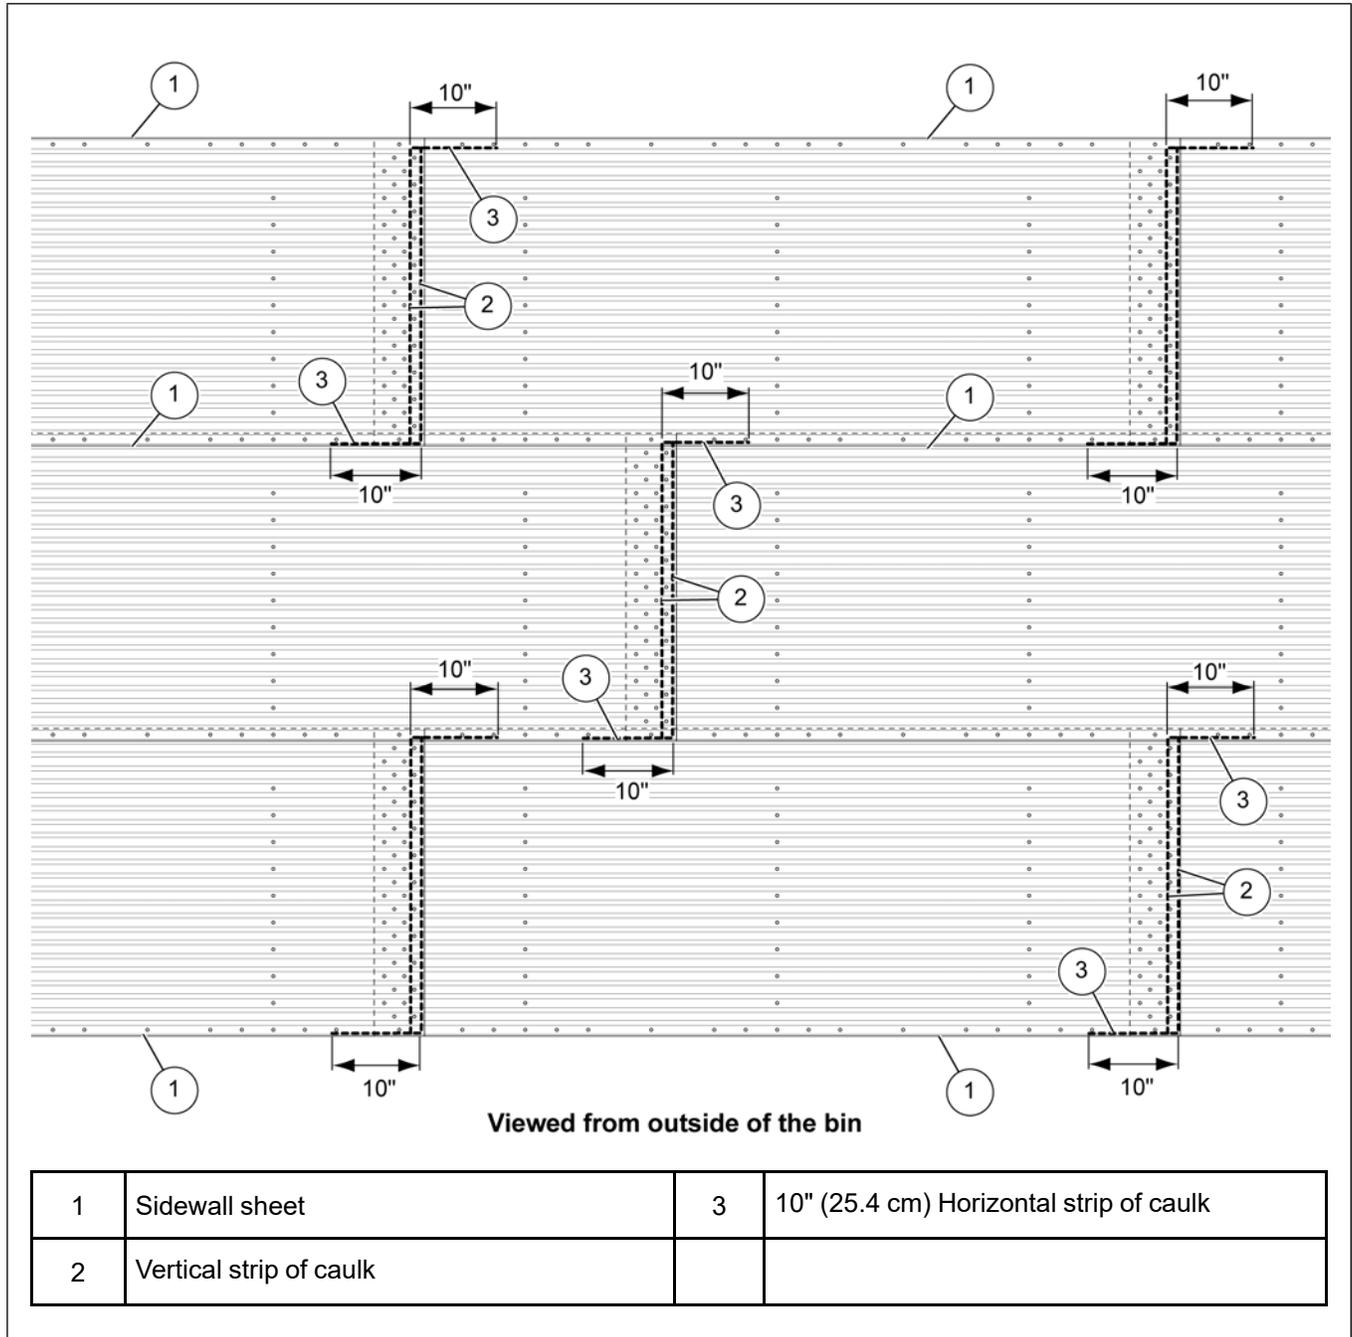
Caulking details for assembling the non-laminated sidewall sheets
